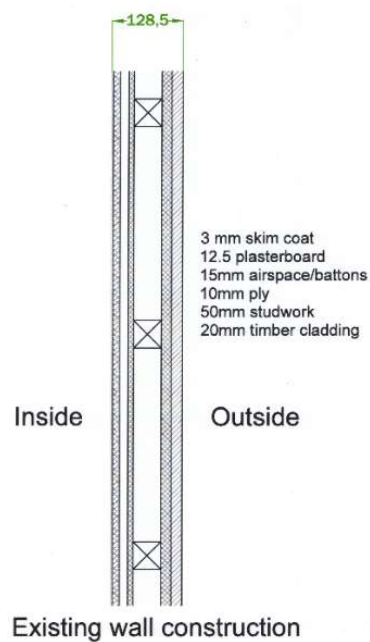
Cross section of original wall (South Norfolk Council, 2015 online)
